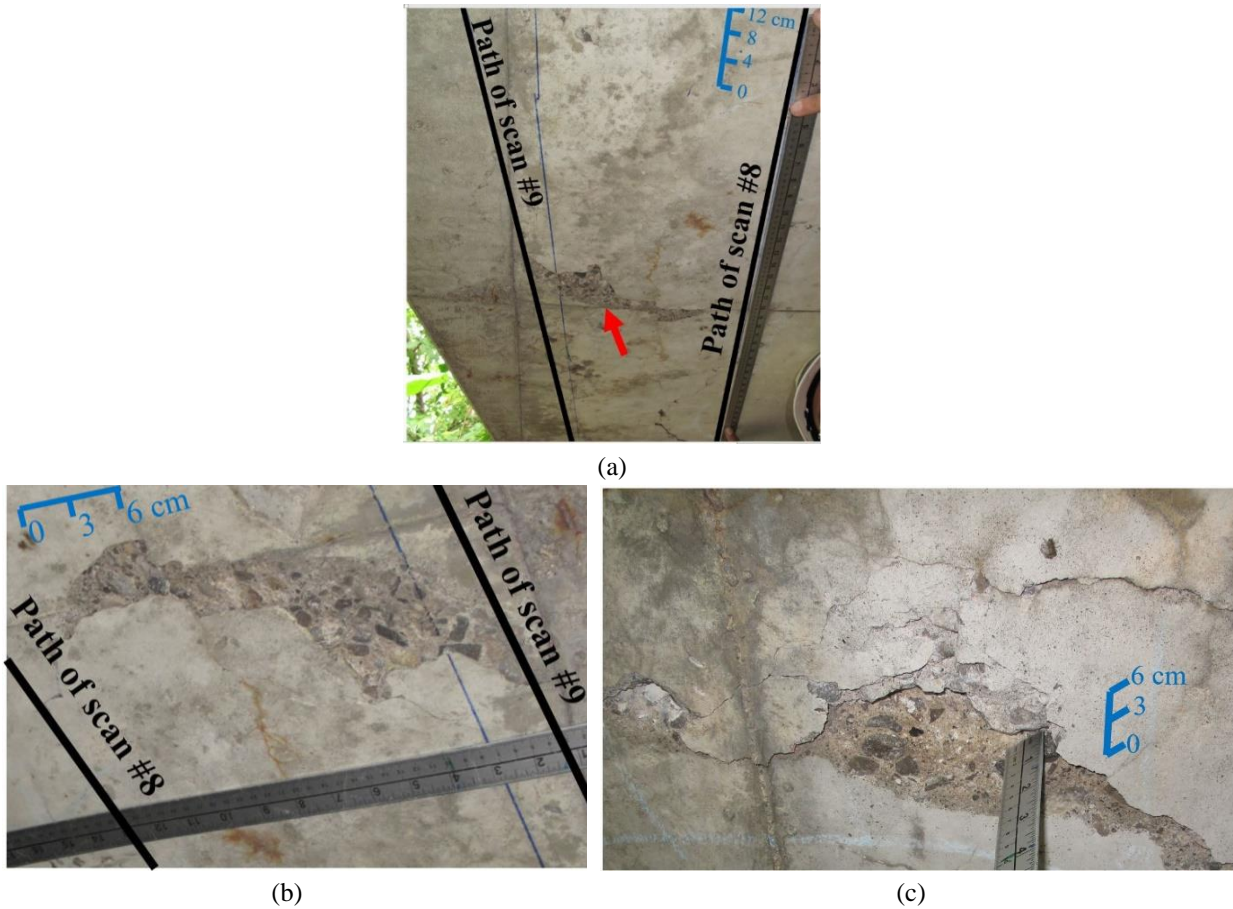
Concrete conditions from 200 cm to 300 cm (from West wall) in the path of scans #9: (a) indicating the place of concrete spalling; (b) closer view of the concrete spalling, representing its extension scale; (c) closer view of the concrete spalling, representing its depth scale.
